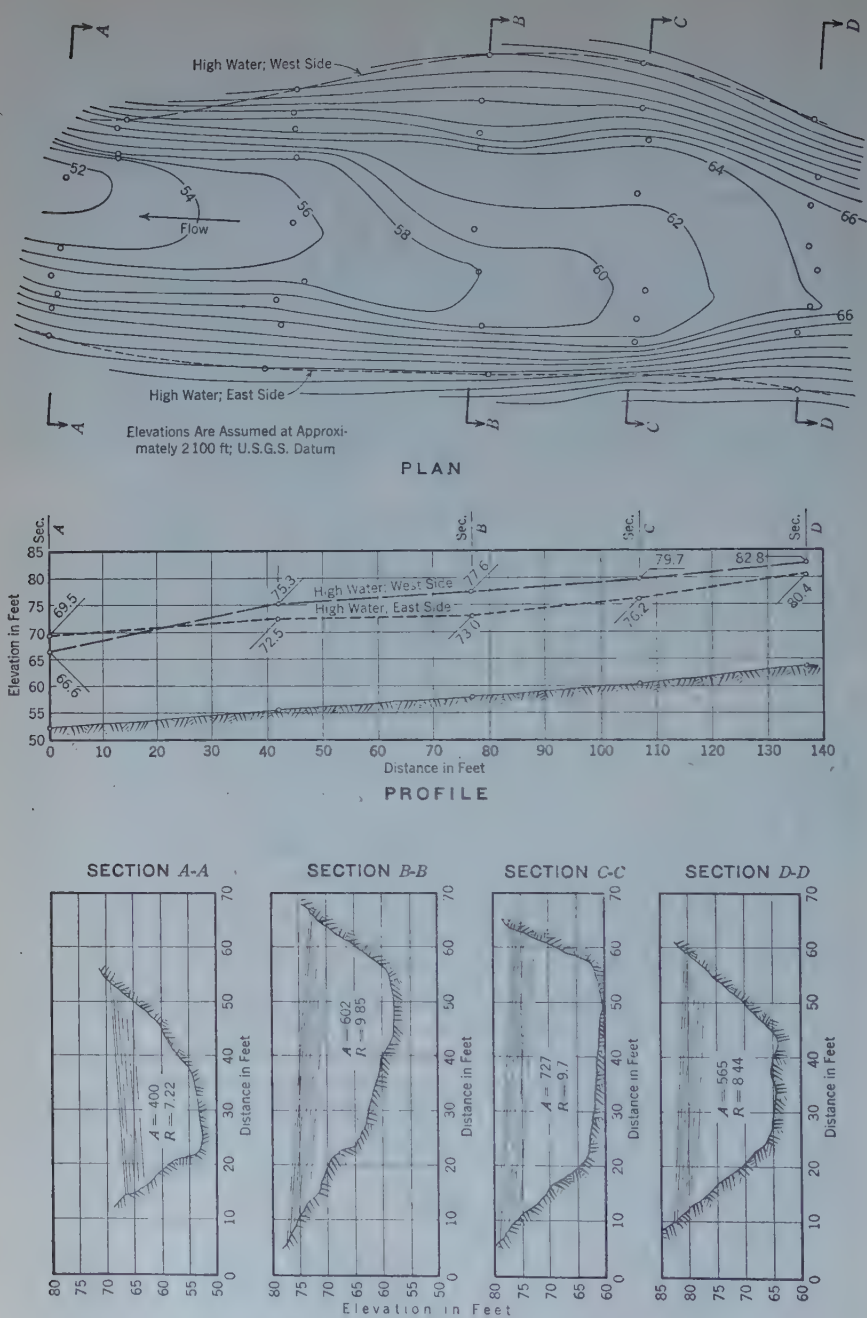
PICKENS CANYON: PLAN AND PROFILE OF CANYON, JANUARY 1, 1934.
